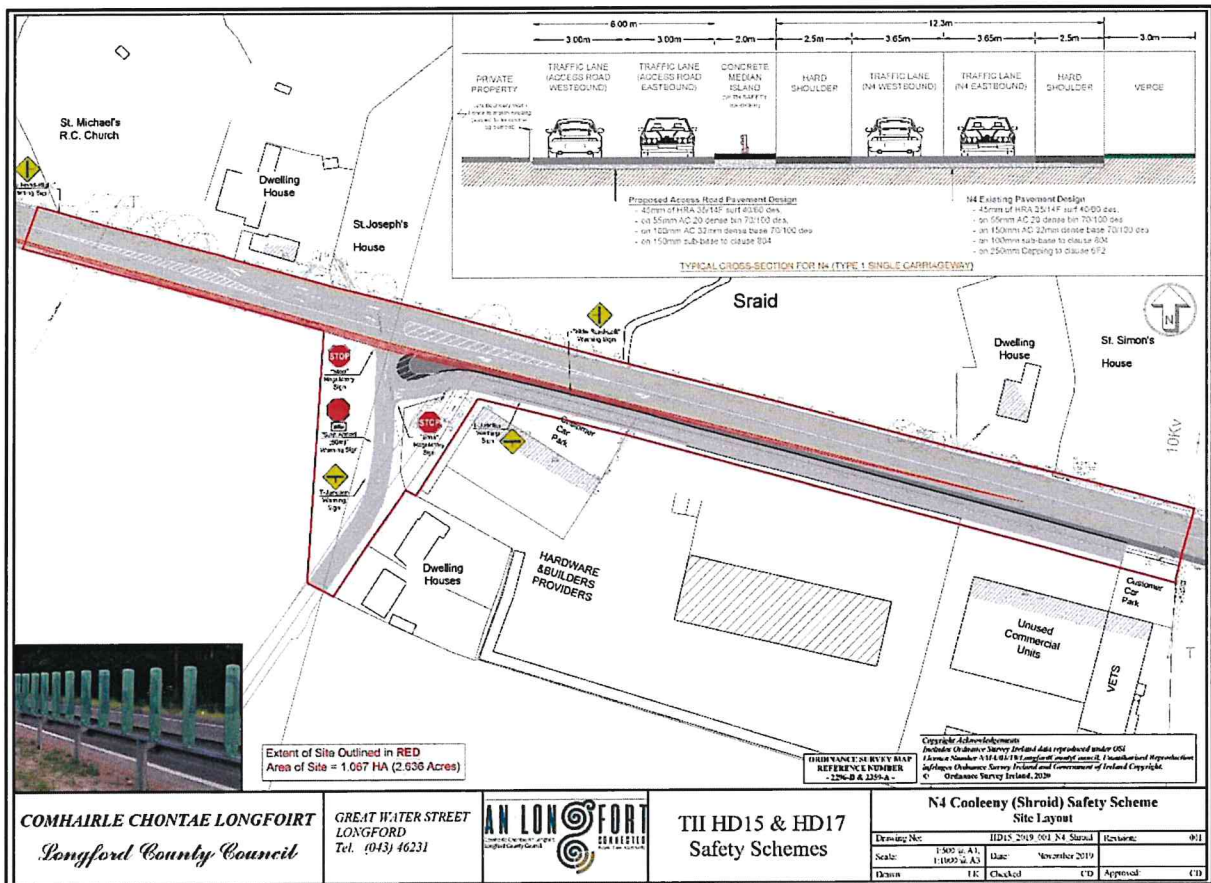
Site plan showing proposed new road layout (Source: Longford County Council)
